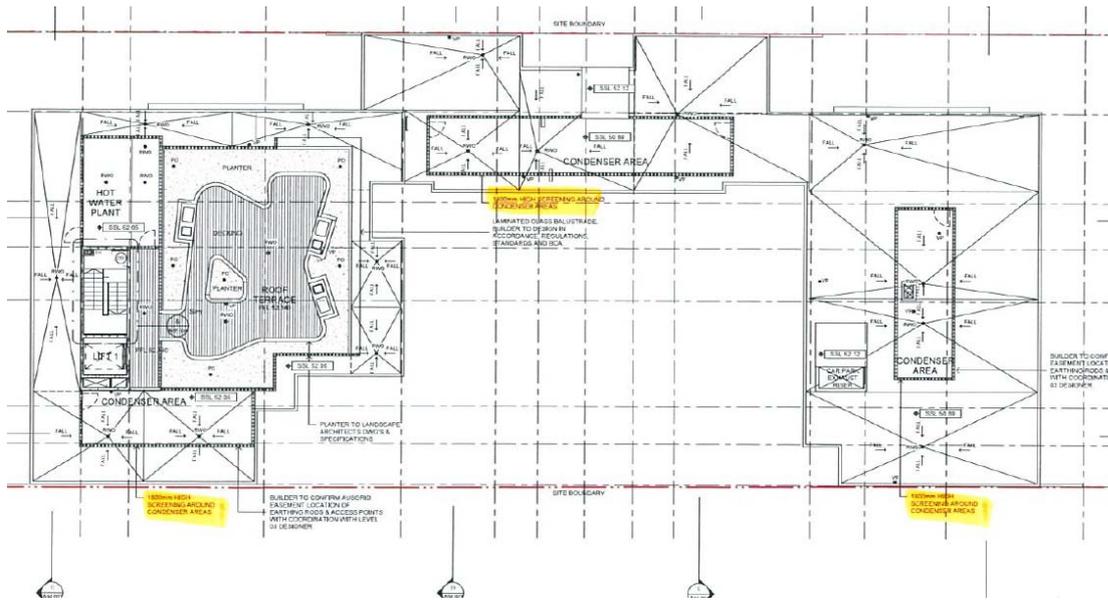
Roof plan showing x 3 locations of proposed plant screening (highlighted yellow). Note – Green Street to the right and Maroubra Road to the left.
